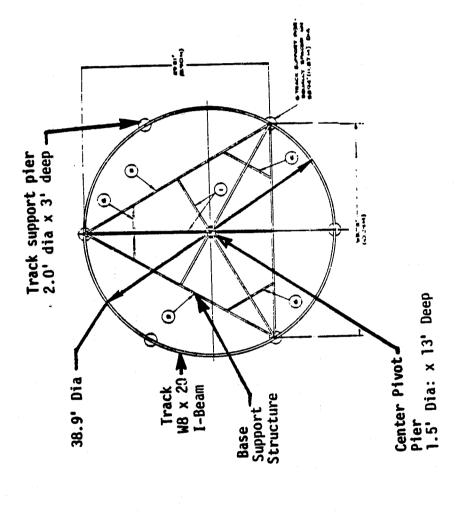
Foundation plan view. (Excerpt from Drawing 6848-004, Sheet 1)
